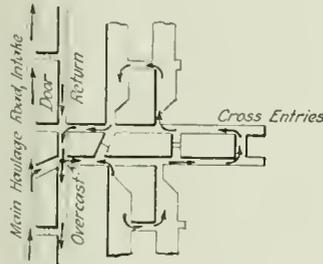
SHOWING PROPOSED PLAN AND CIRCULATION
